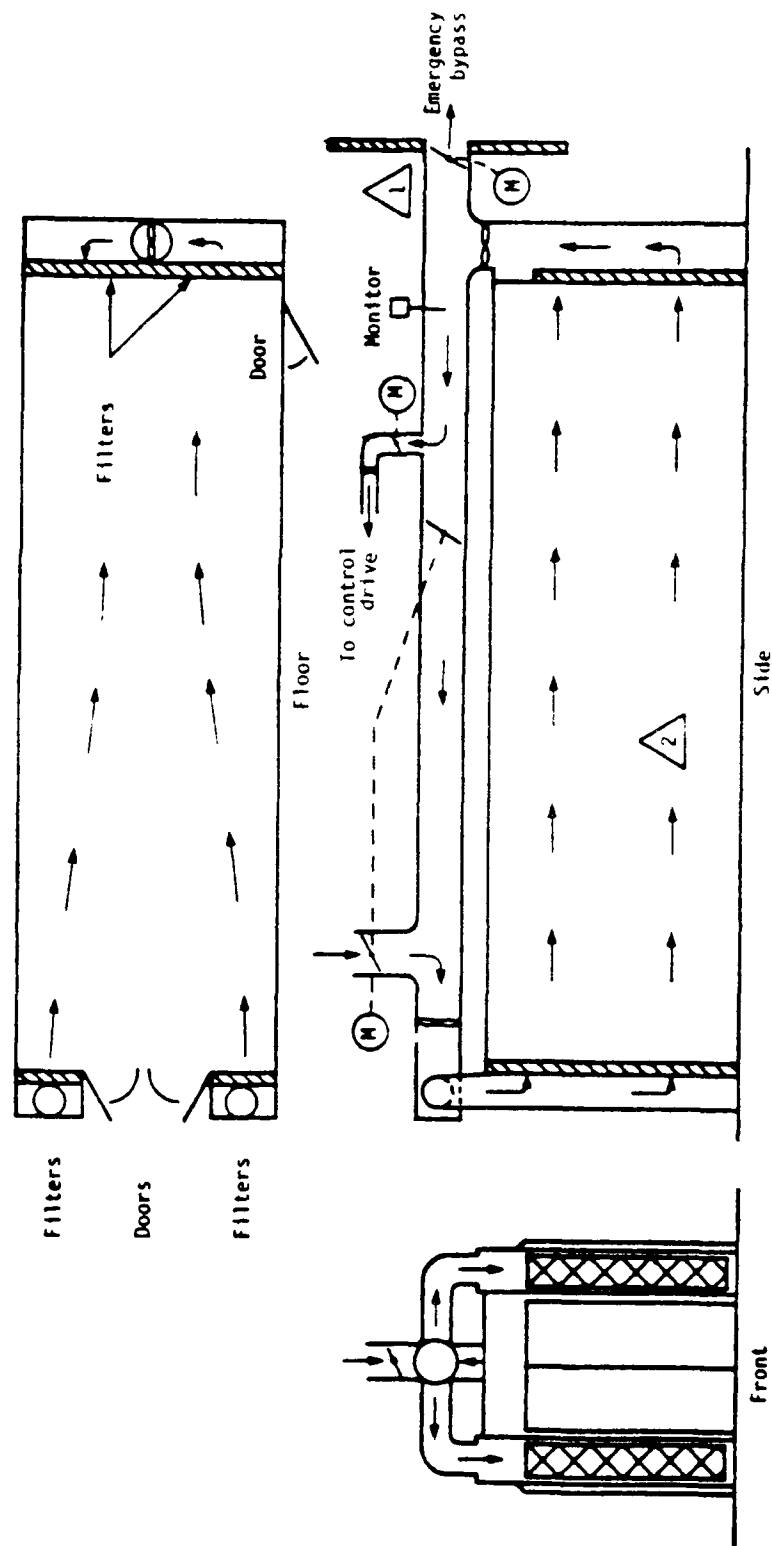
Schematic of Recirculation System -- Travis Air Force Base, Building 1014.
